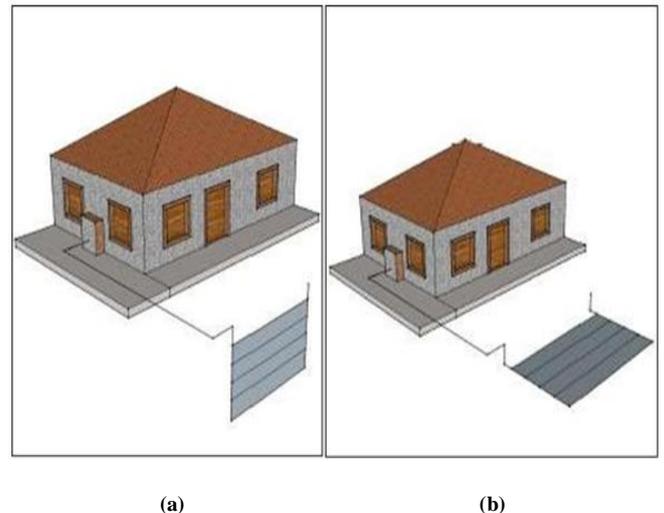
(a) - Vertical earth piping cooling VEPC system, (b) - Horizontal earth piping cooling HEPC systems
